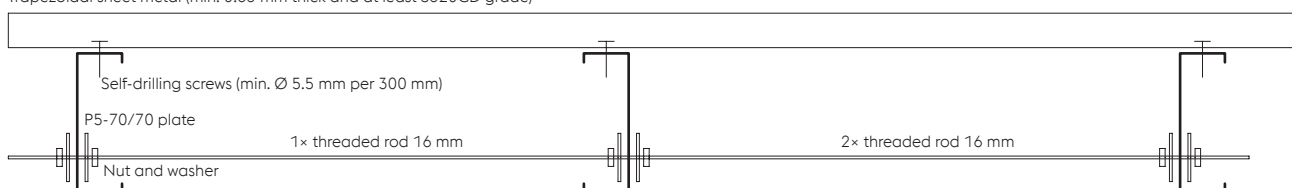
Arrangement of stabilising bars in case of an odd number of floor beams in a heavy floor construction
